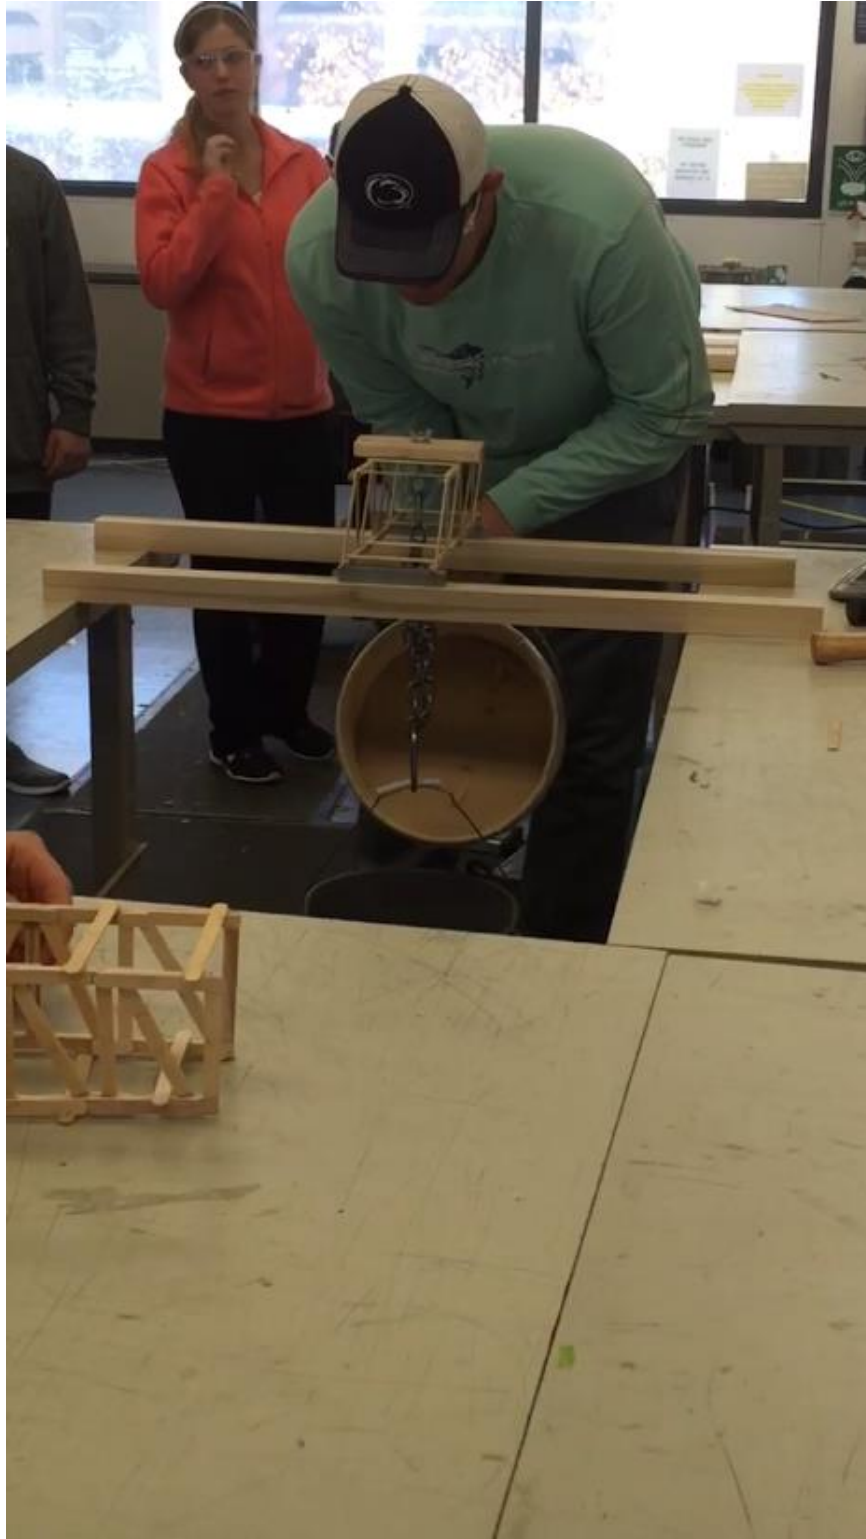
Warren Truss Bridge Prototype Before Load Testing
